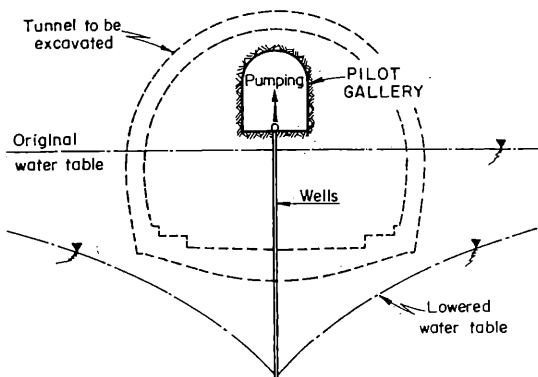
DEWATERING OF LOWER HALF-SECTION (T.G.V La Galaure tunnel)
